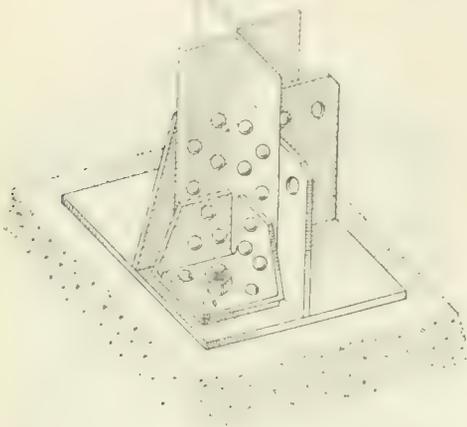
Typical Construction of Footing for Angle Iron Column.
